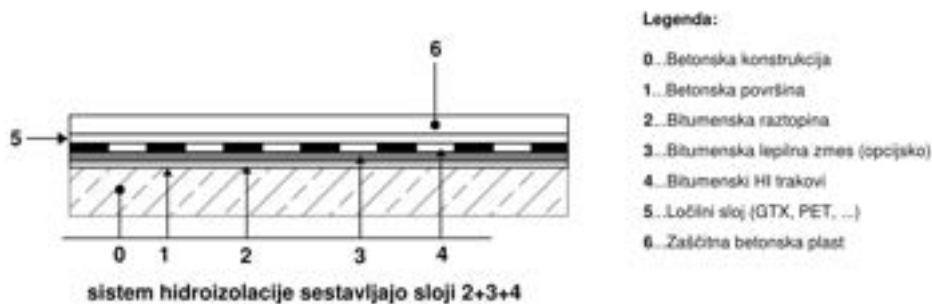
Example of a waterproofing system for buried road bridge structures
